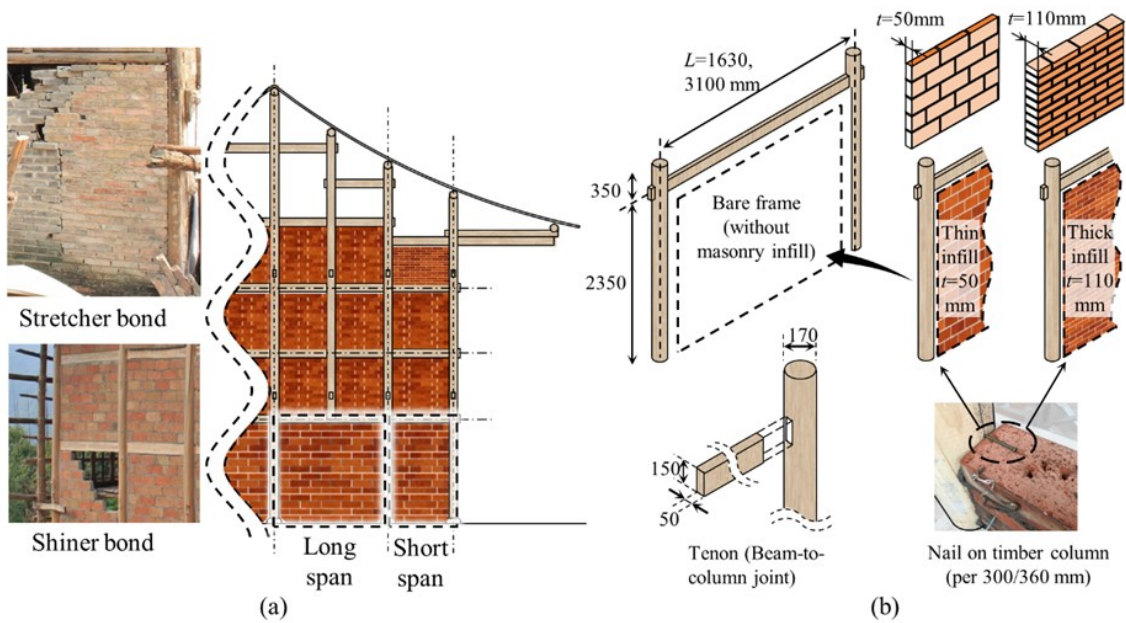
(a) prototype Chuandou frame and (b) specimen dimensions (unit: mm).
